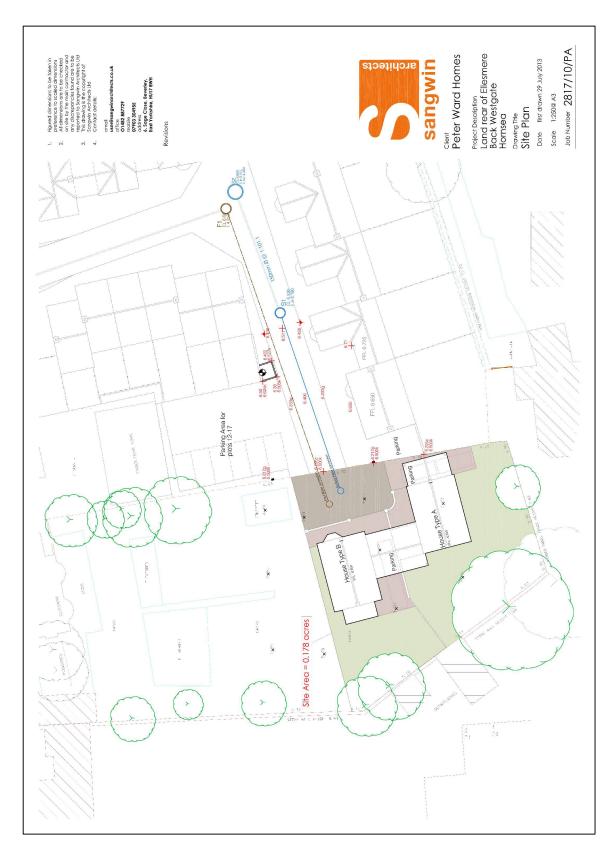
PROPOSED SITE PLAN (not to scale - plan supplied by Sangwin Architects)
